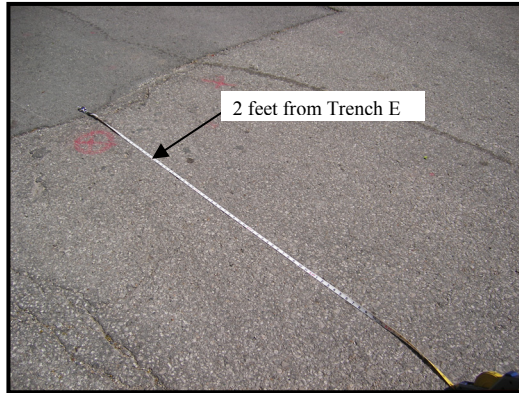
Condition of the pavement 2 feet west of Trench E at FWD testing location 10
